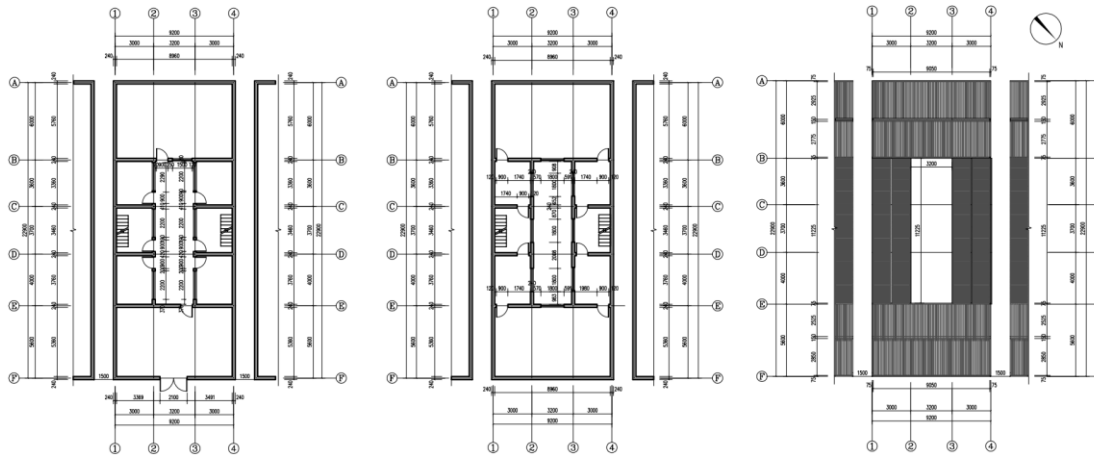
First floor plan, second floor plan and roof plan of the study case.
